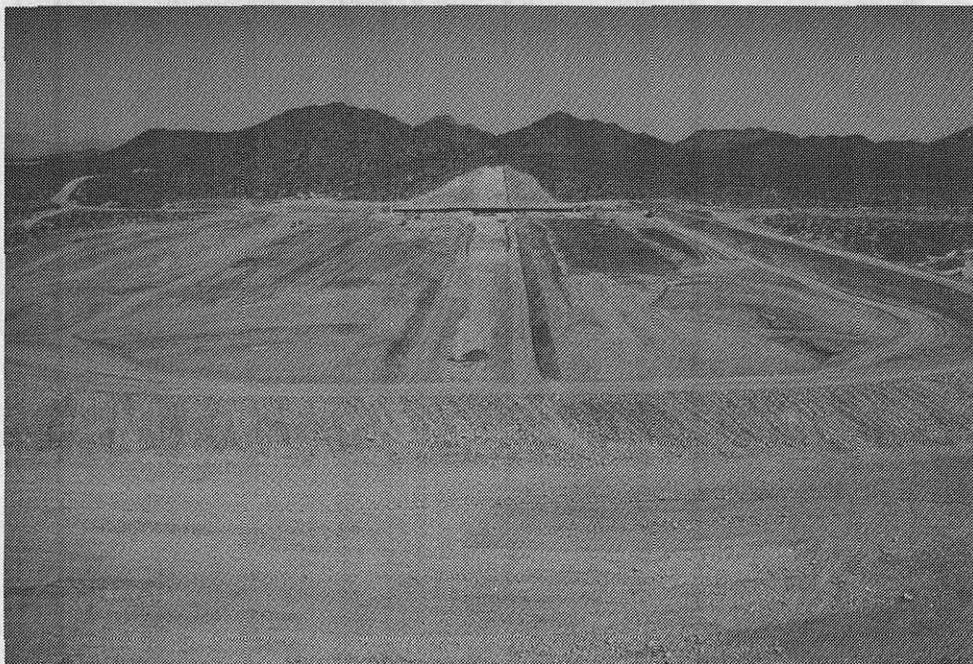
View of stage II diversion levee protecting completed stage II excavation to station 26+50. Note Stage I embankment protective cover in foreground. March 1984
